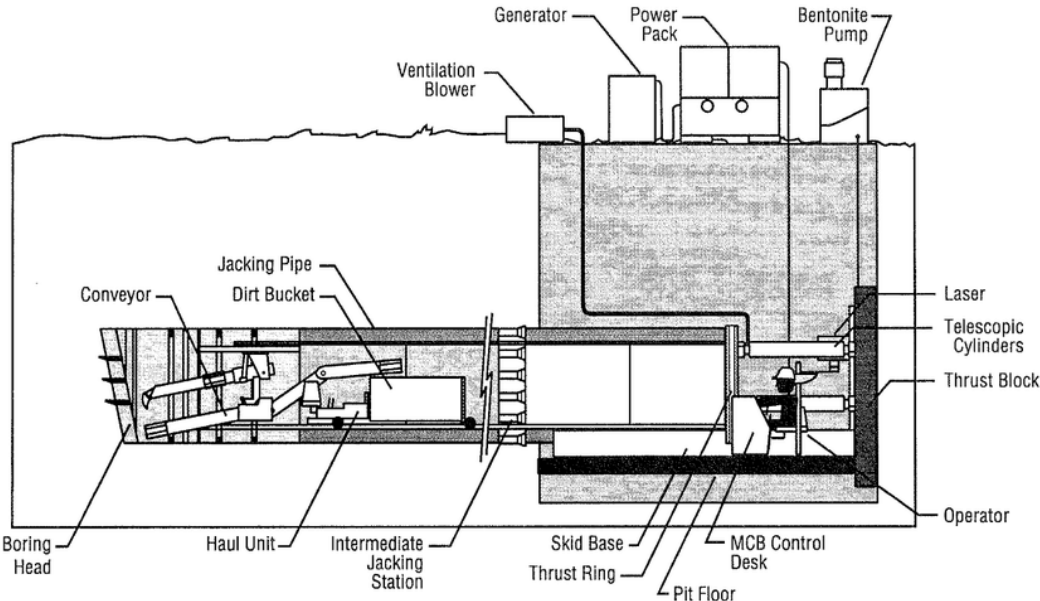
Schematic of a pipe Jacking Operation. (Source: www.researchgate.net/figure//Pipe-jacking)
